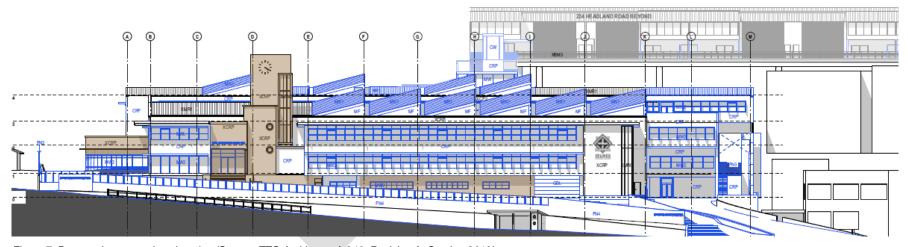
Proposed western elevation plan (Source: TZG Architects, A-210, Revision A, October 2019)
